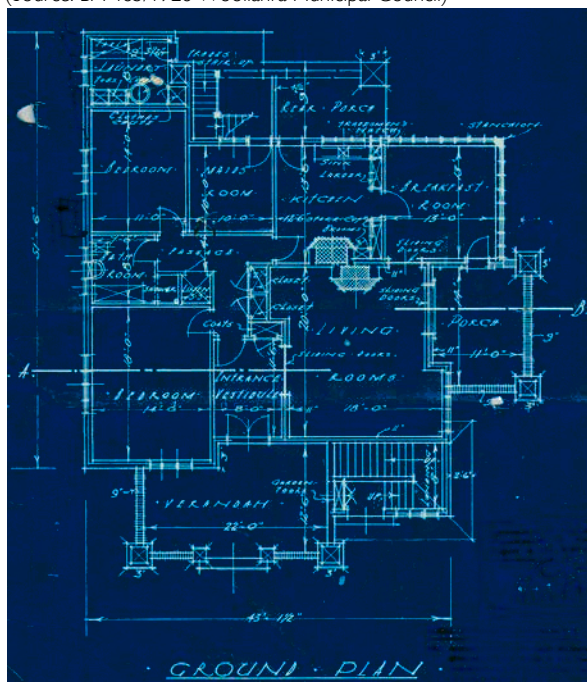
Residence for P.G. Craig Esq, 36 Kent Road, Rose Bay. Ground Floor Plan (note: the First Floor is similar). Architect: P. Gordon Craig, 1926 (Source: BA 465/1926 Woollahra Municipal Council)
